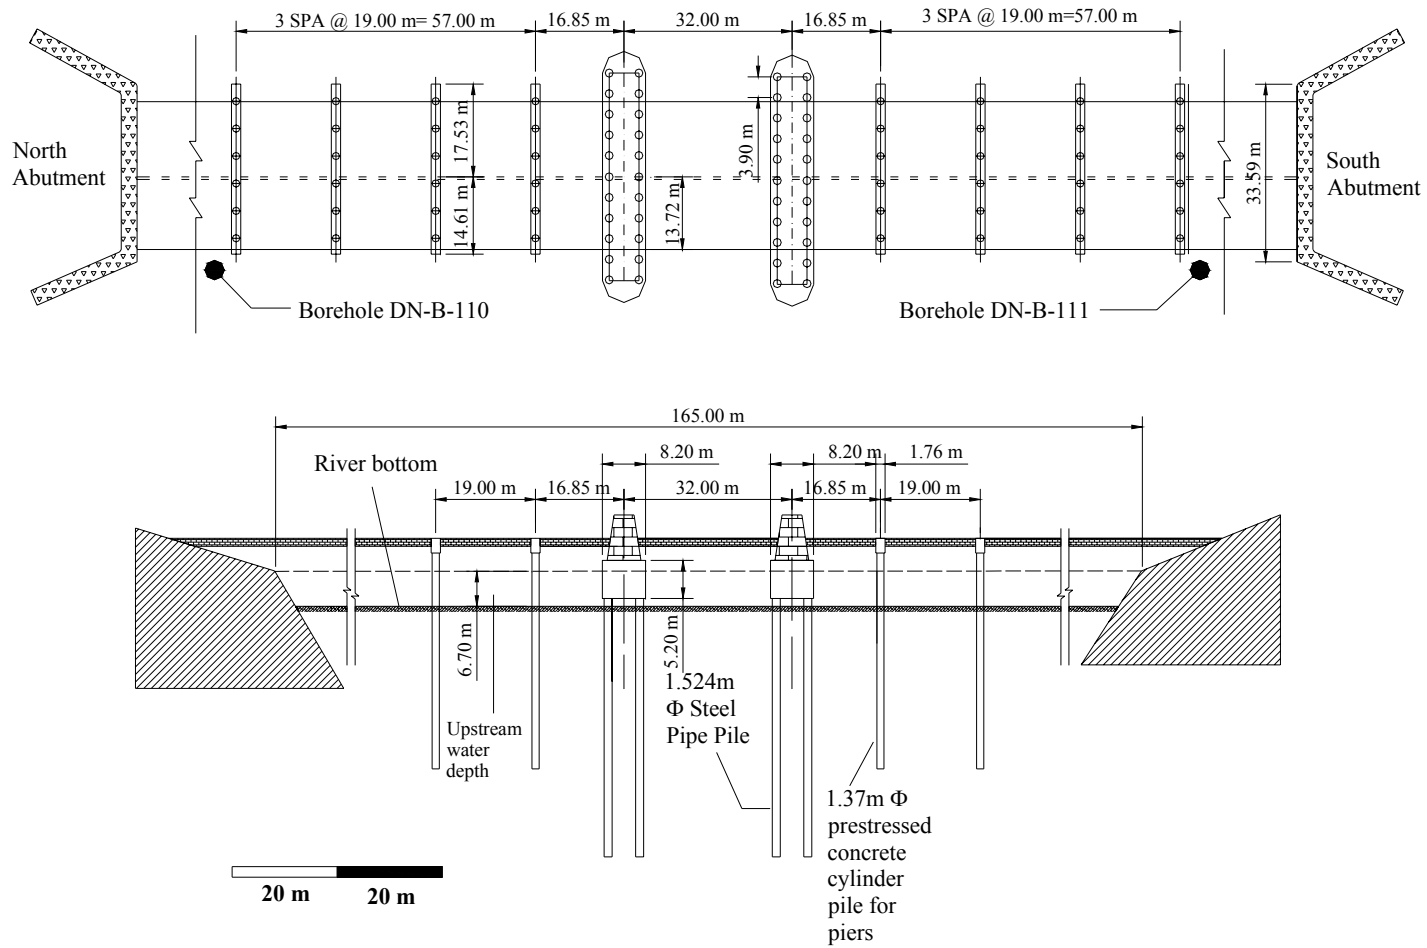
Overview and Cross Section of the New Sloop Channel Bridge over Sloop Channel on Wantagh Parkway
